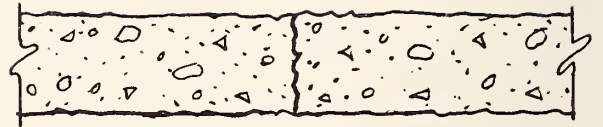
Injection Beam Grouting (Ref. 57)
